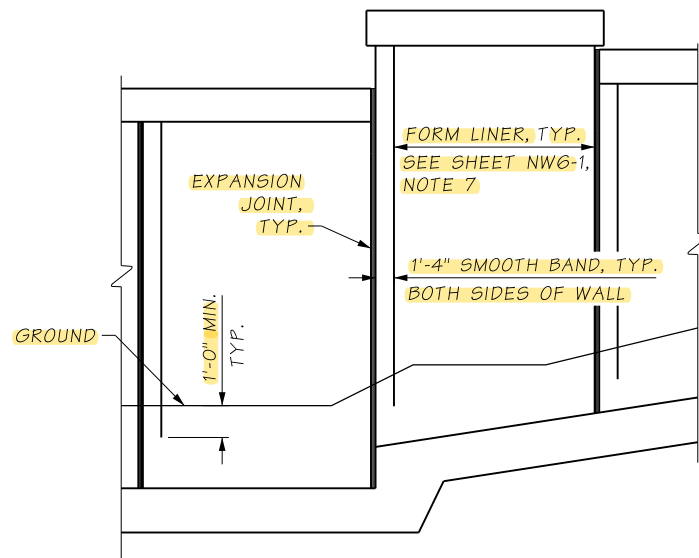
DETAIL A - ALTERNATIVE 1: PRECAST CAP
